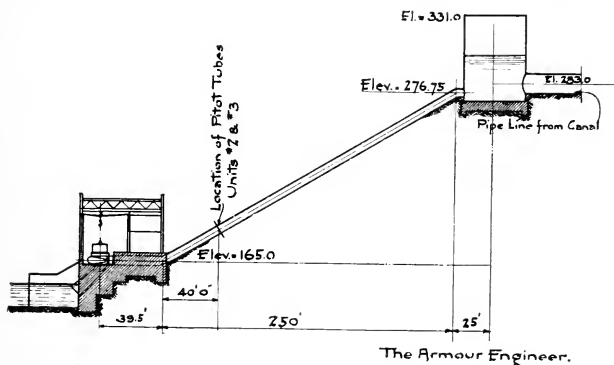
Vertical Section, showing Penstocks, Surge Tank and Power House.
